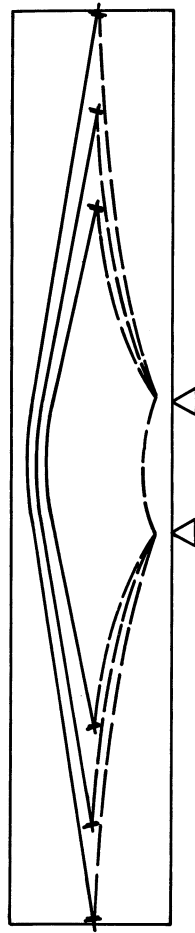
Intermediate anchorages away from the compressed face
